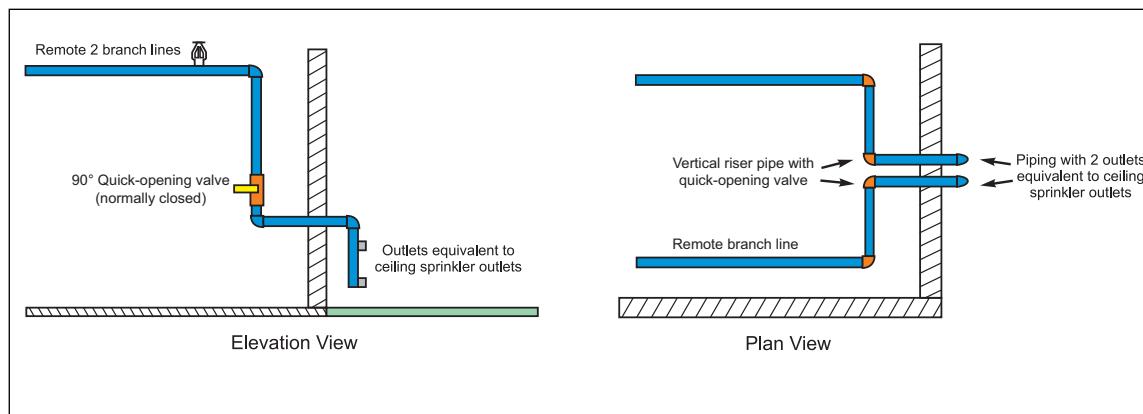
(b). Example arrangement of an inspector's test connection for a dry sprinkler system design using 2 sprinklers on the most remote 2 branch lines (4 sprinklers total)
